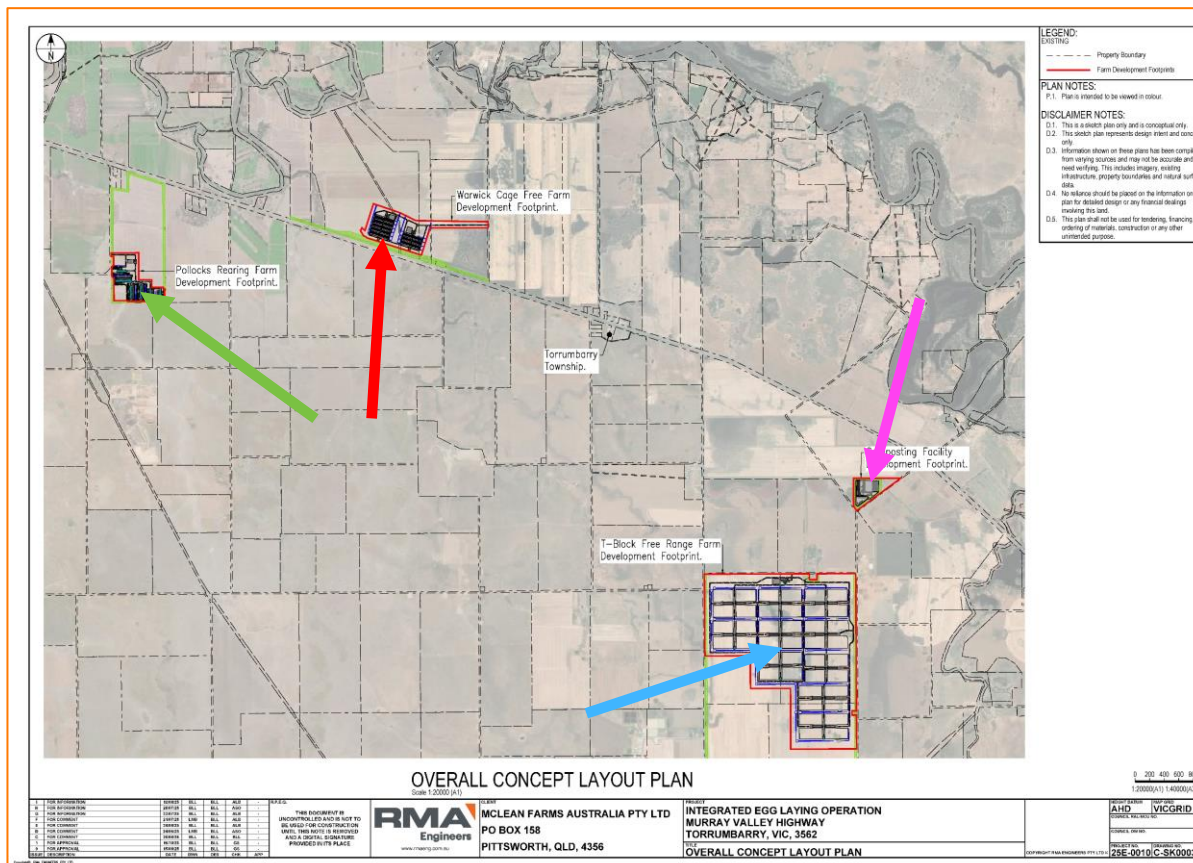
Proposed Layout (Source: RMA Engineers)
